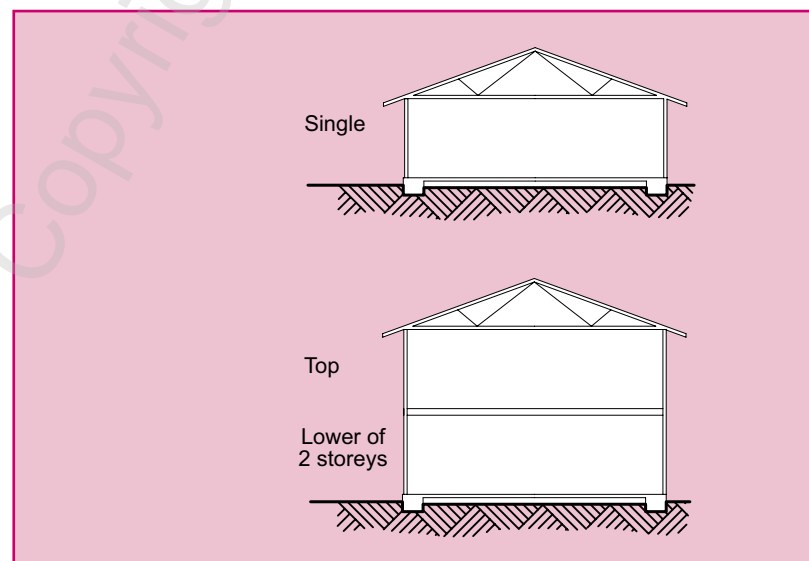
Location of wall framing for the purposes of table 8.2 (see C8.5.1.1)
